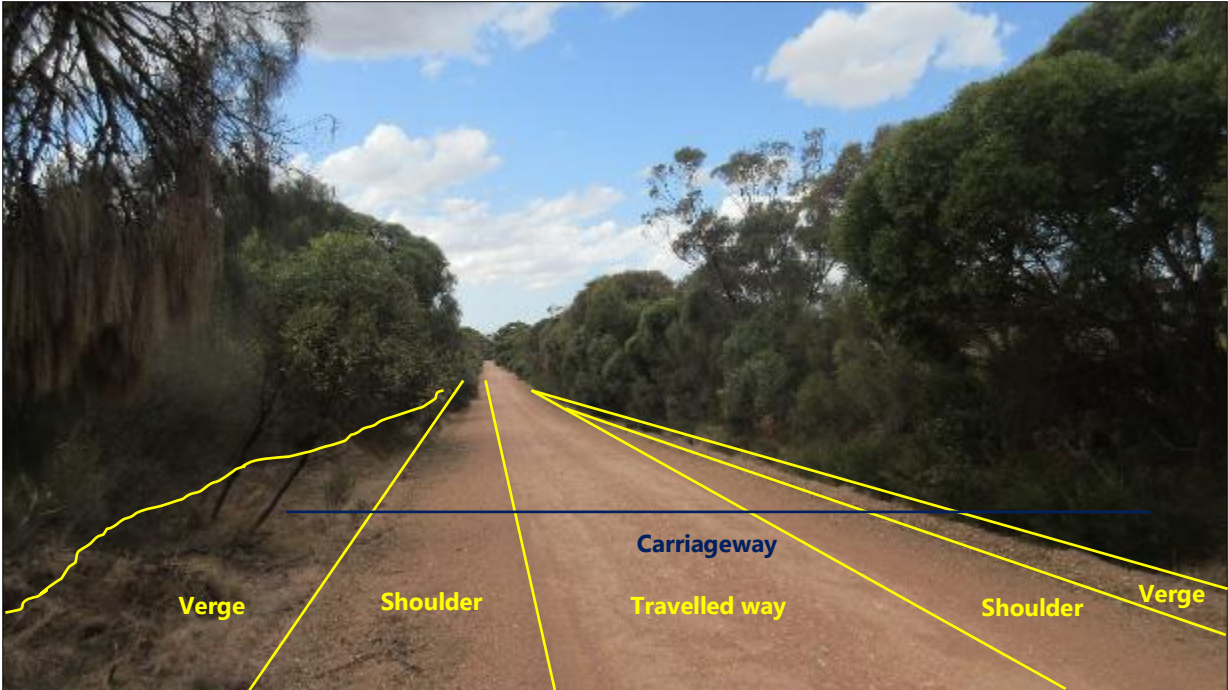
Example of the varying sizes of the travelled way, shoulder and verge.
